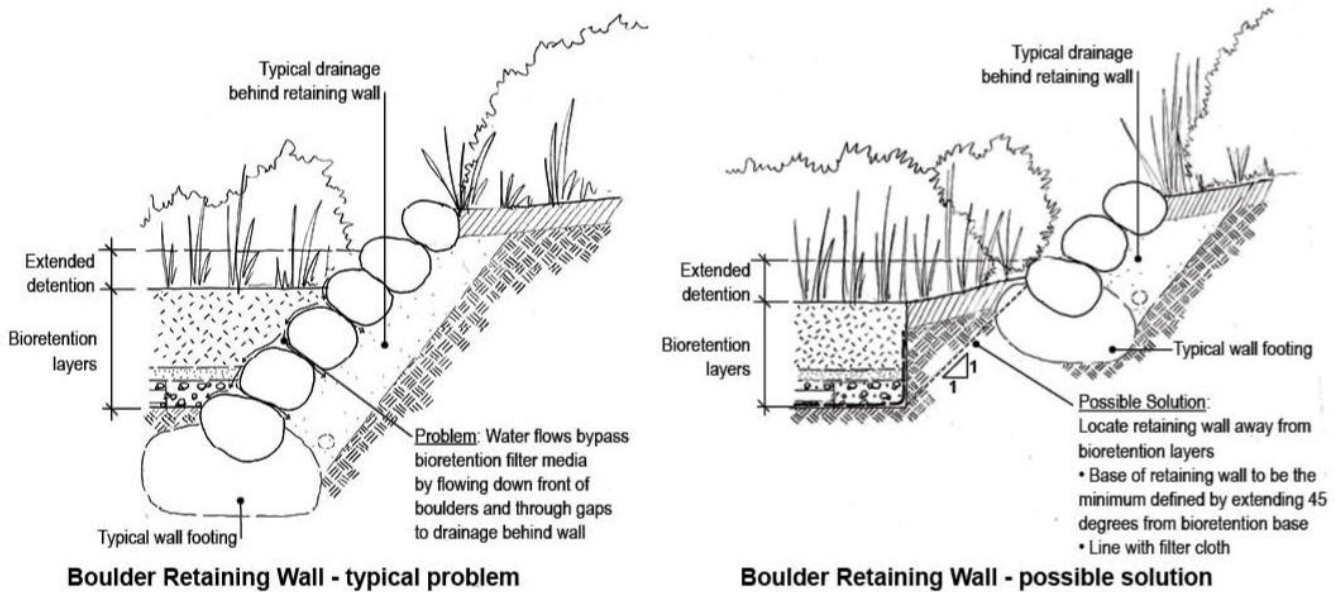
Uneven rock walls should not be used as the subsoil interface.
